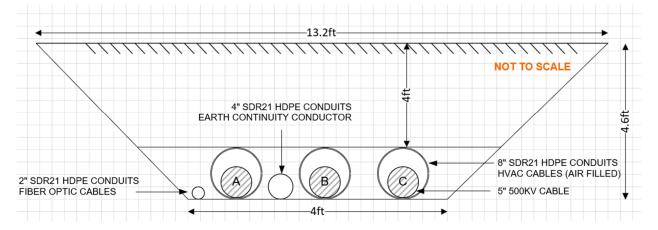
Conceptual Design for HV Underground Cables in Open Cut Trench
